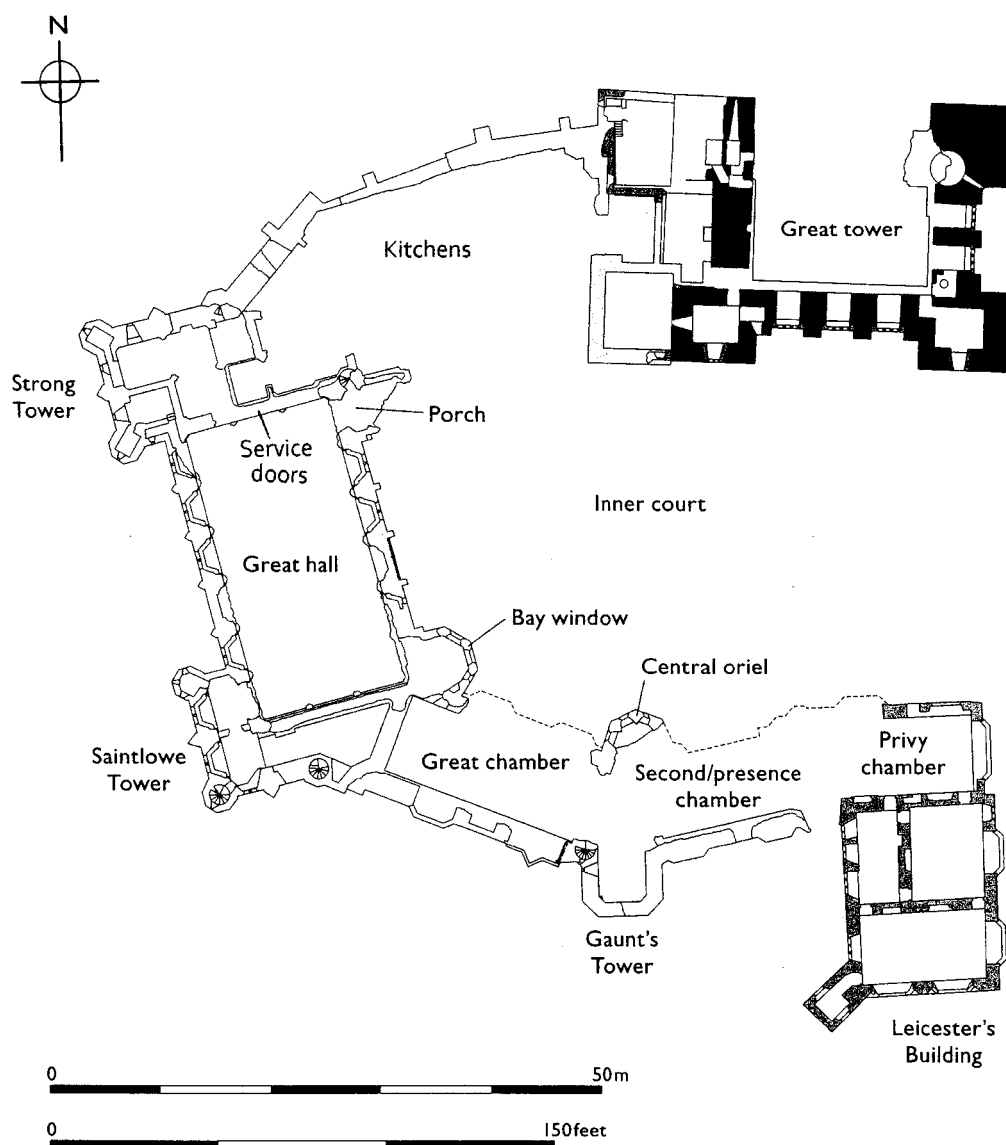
Kenilworth Castle: inner court, the hall and medieval apartments, plan at first-floor level; the Great Tower is 12th century and Leicester's Building 16th century
